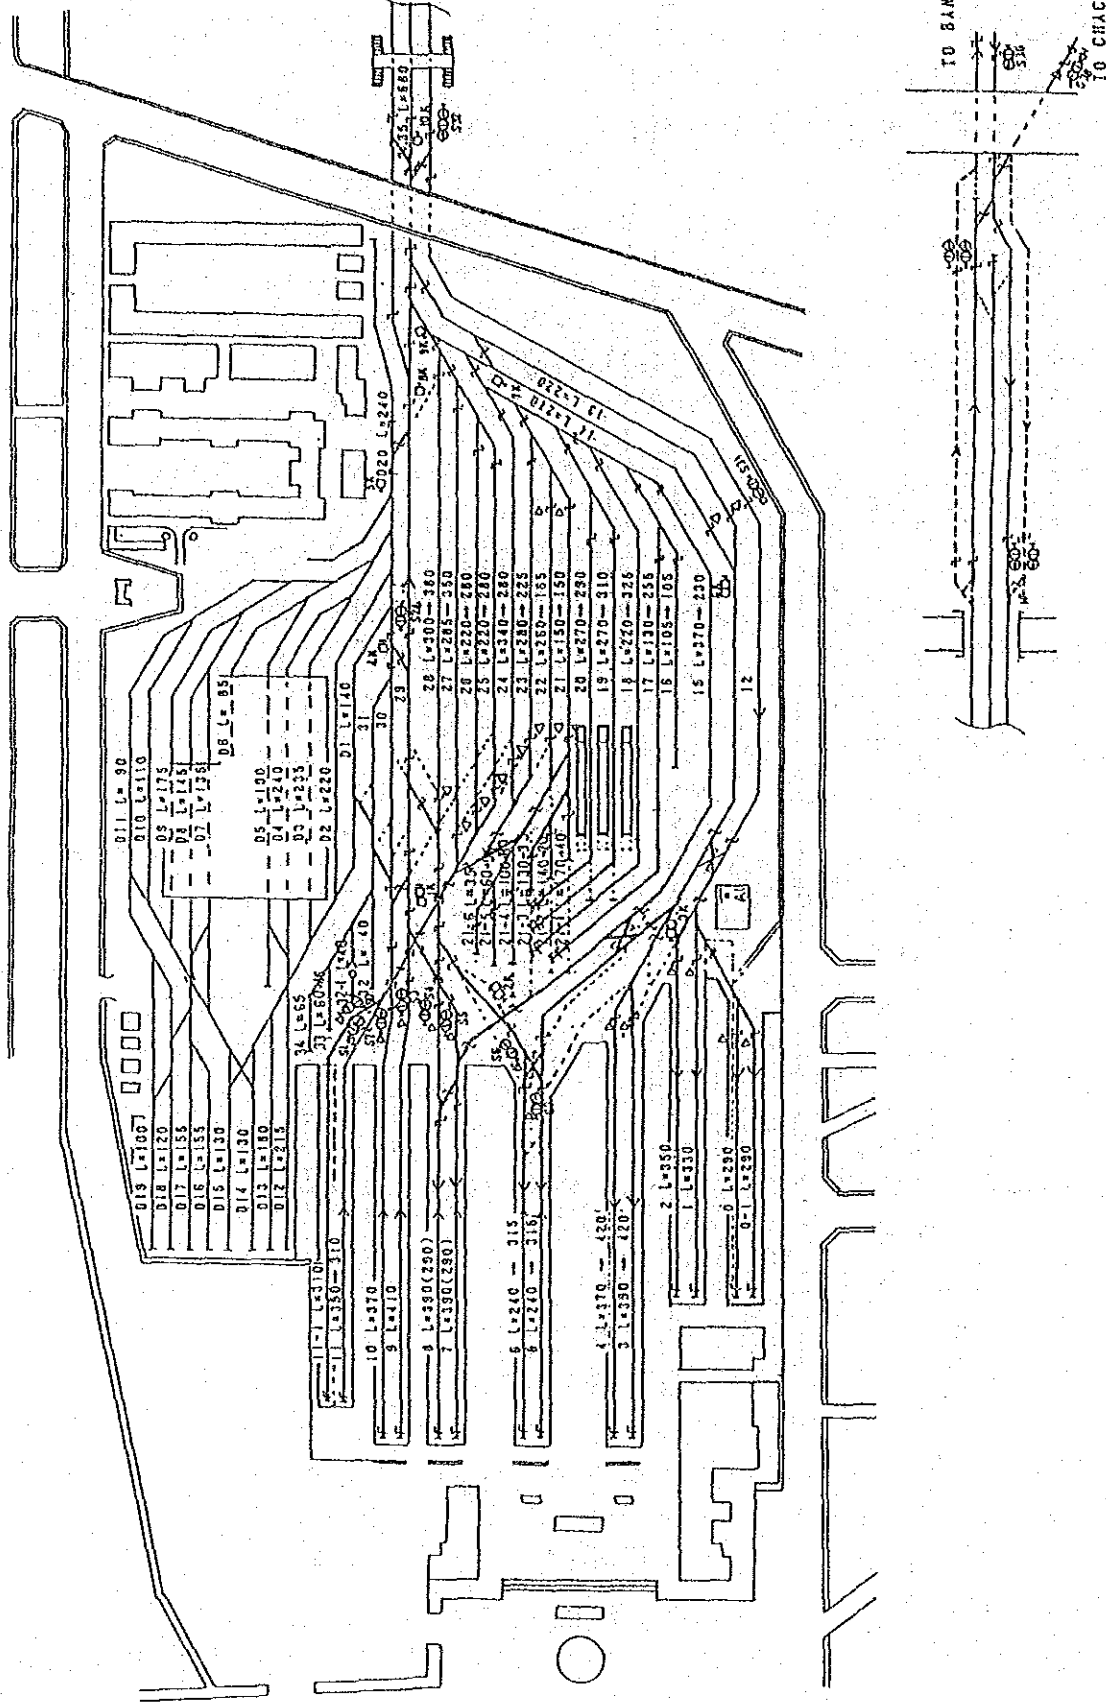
Future Signalling Facilities at Bangkok Station (Master Plan)
